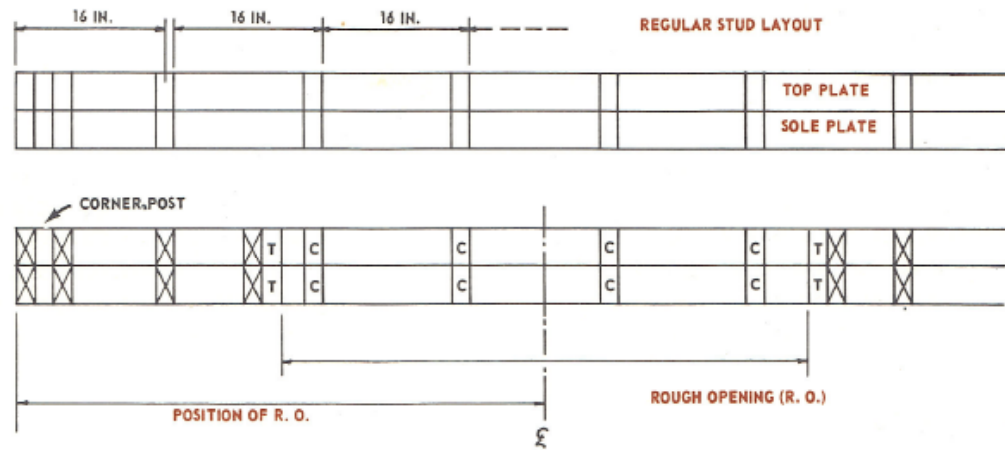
Layout of sole and top plates. Above. Regular stud spacing marked. Below. Converted for window opening.
